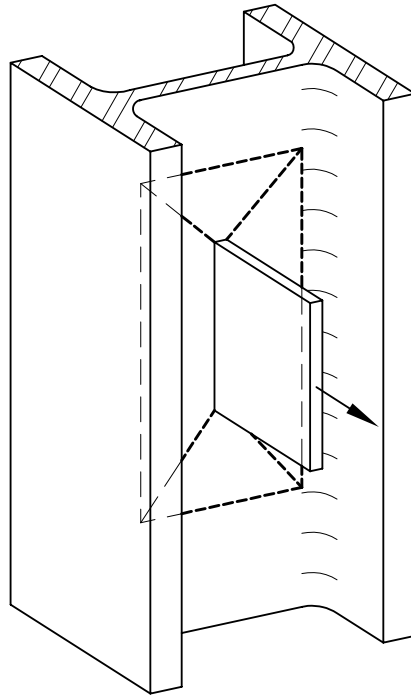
Yield lines due to transverse forces on plate elements.
